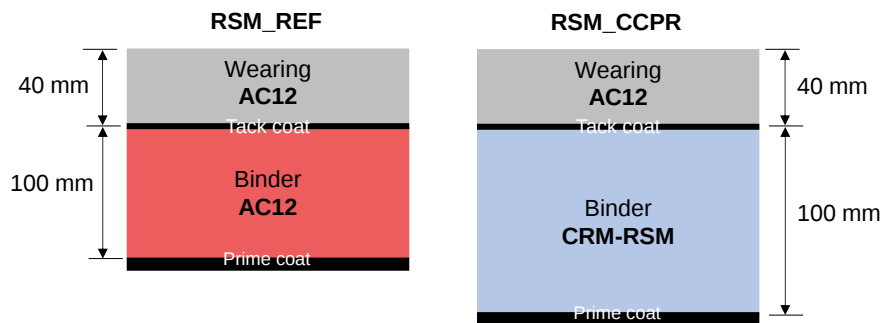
Pavement structures considered for the Republic of San Marino case study: reference pavement (on the left) and pavement with CRM (on the right)
